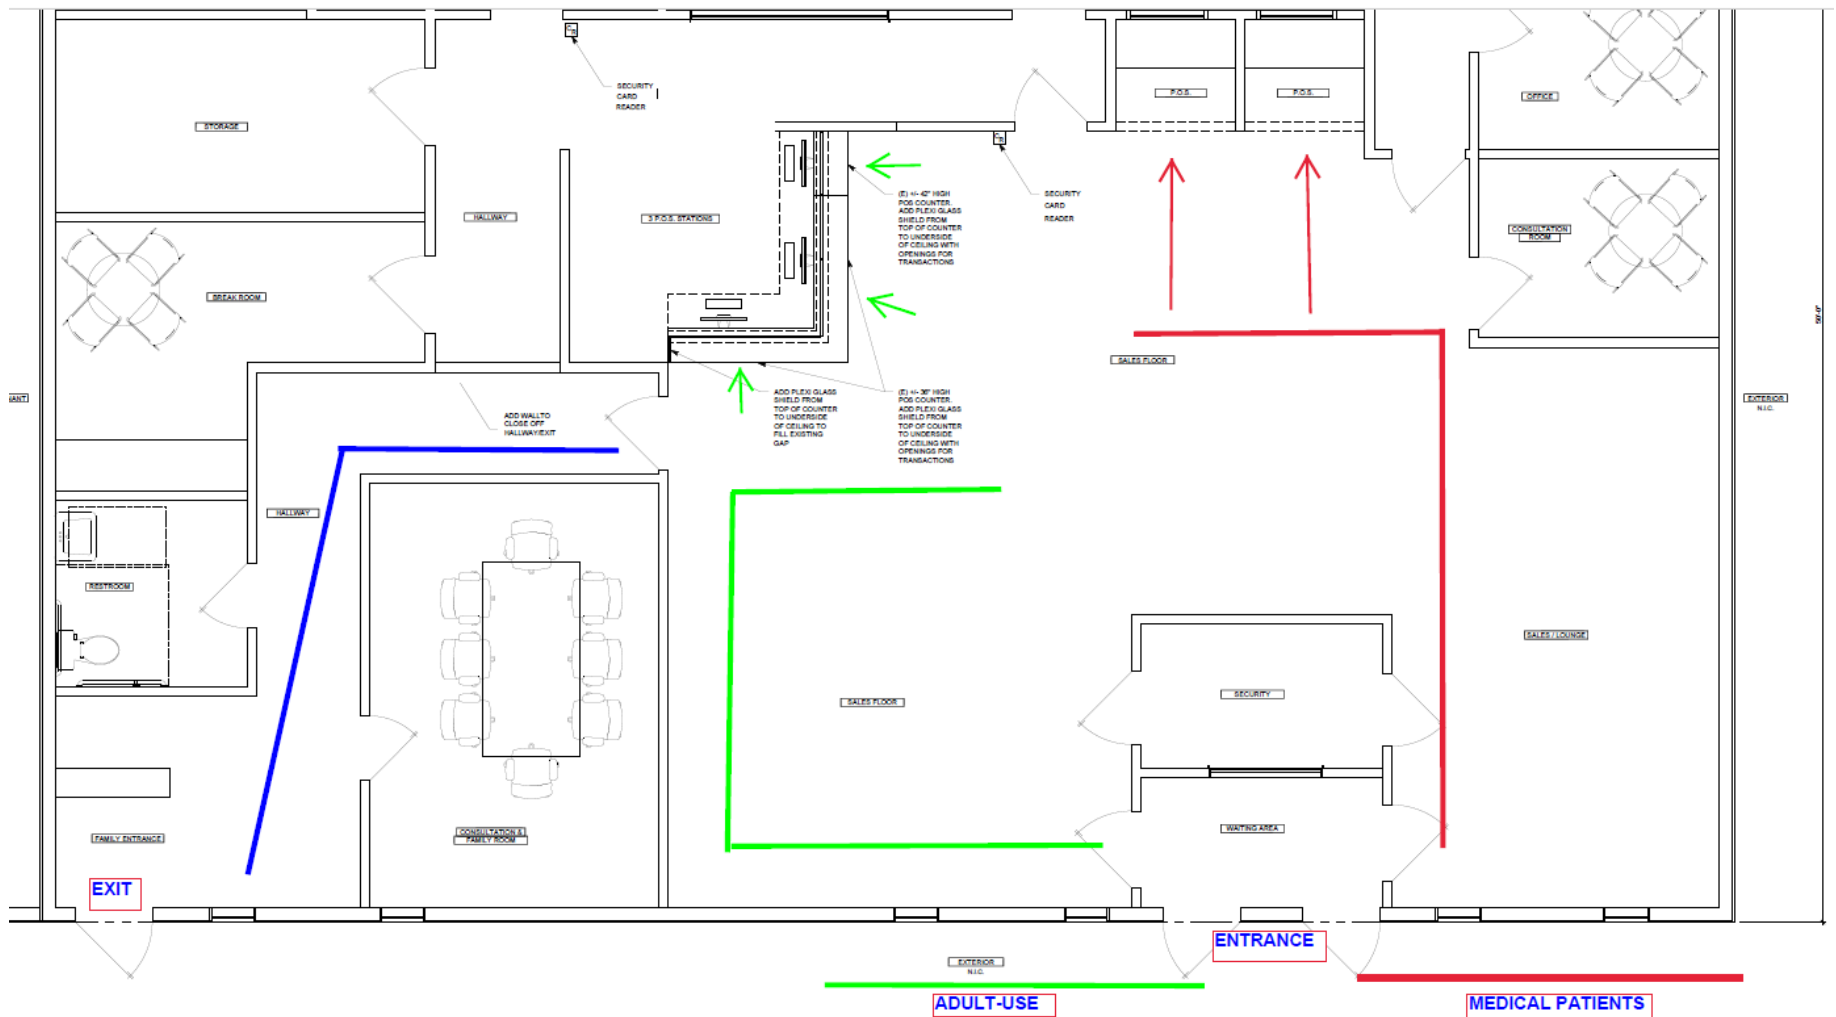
Annotated floorplan of Curaleaf's tenant space (submitted by applicant).
